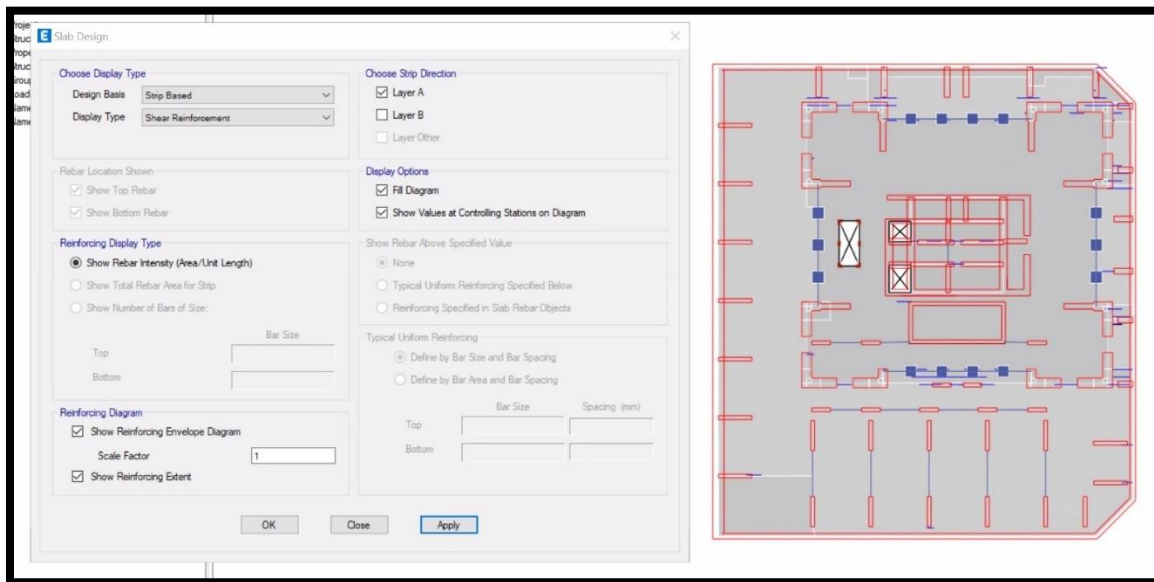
Shear Reinforcement in X-Direction for Ground Floor
